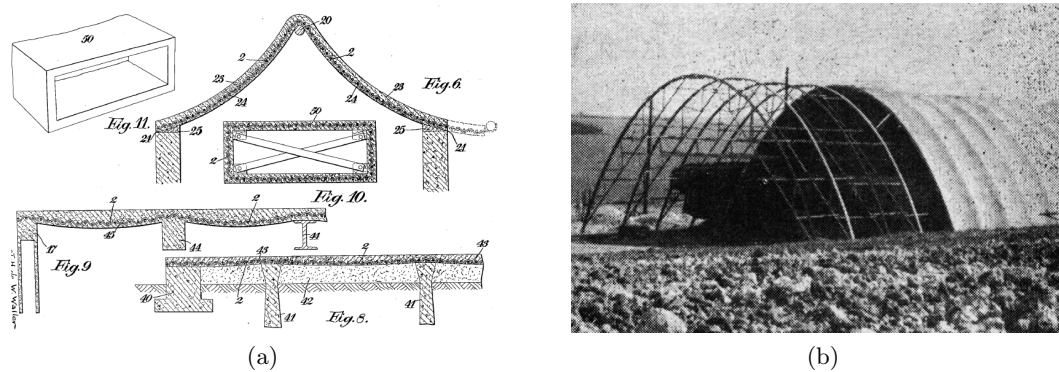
Fabric formed concrete structures by Waller: (a) Patented fabric formed elements and (b) Ctesiphon system
